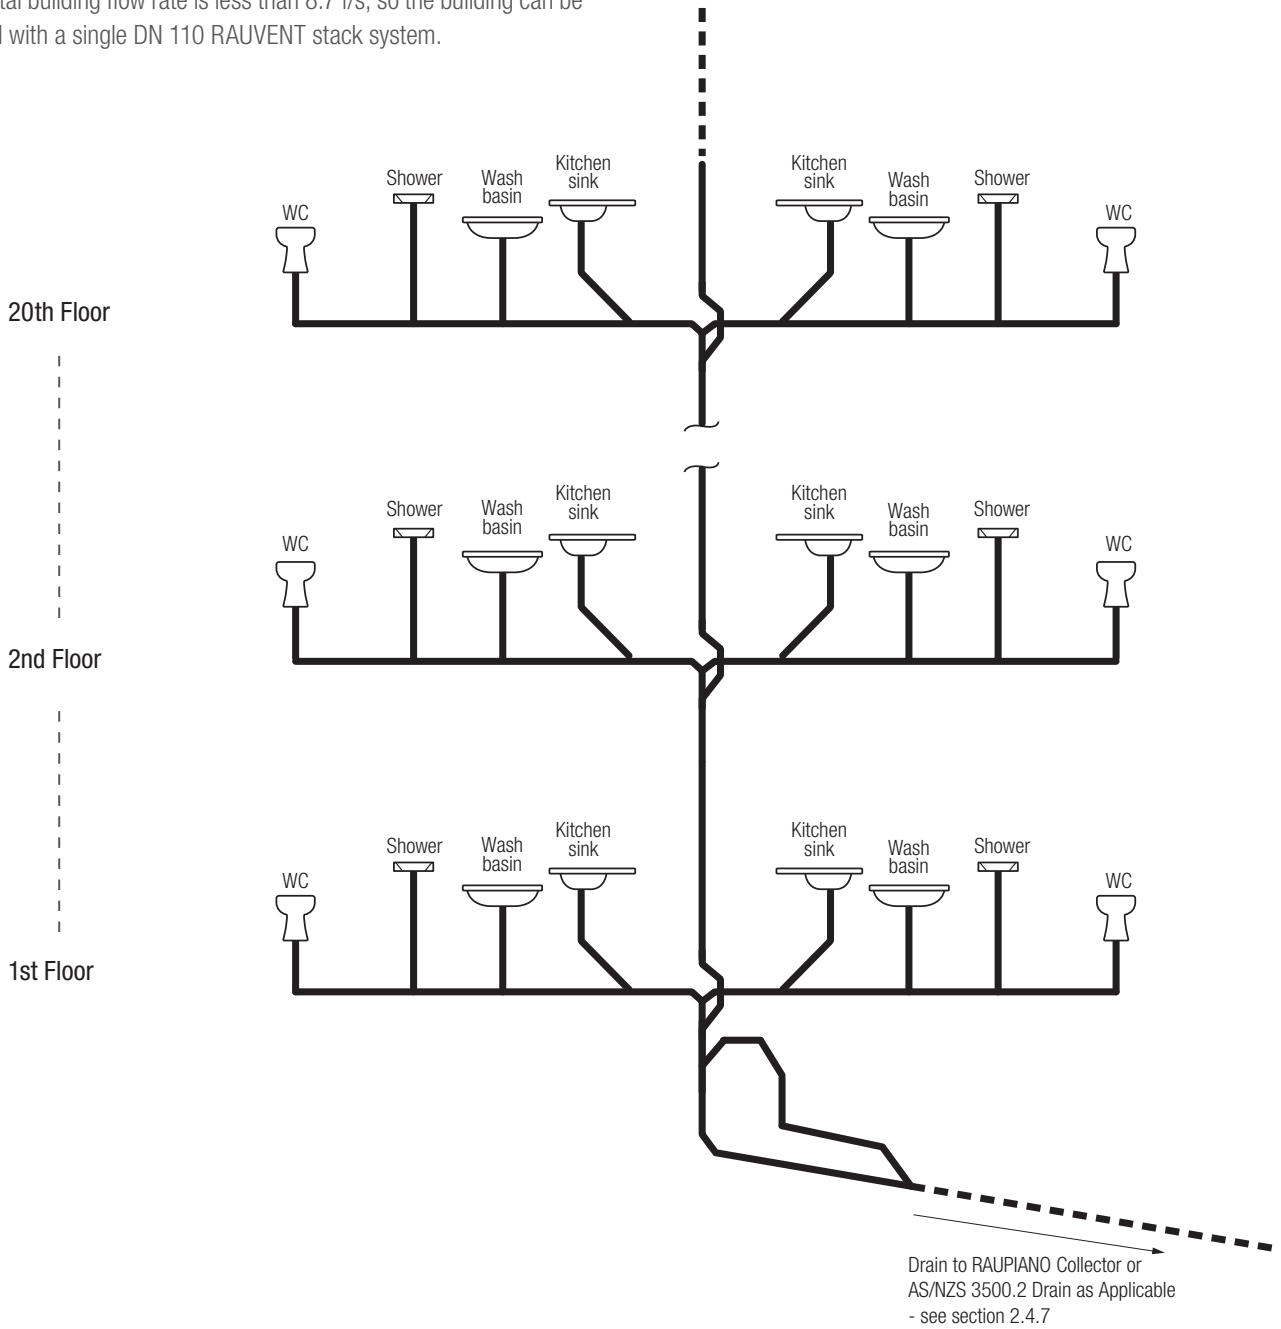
RAUVENT RVASS drainage plan – Example 1
